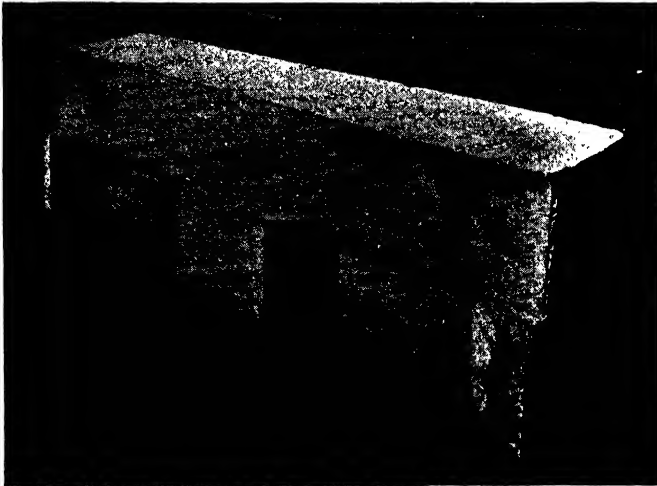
INTERLOCKING JOINT. FORM REMOVED.
